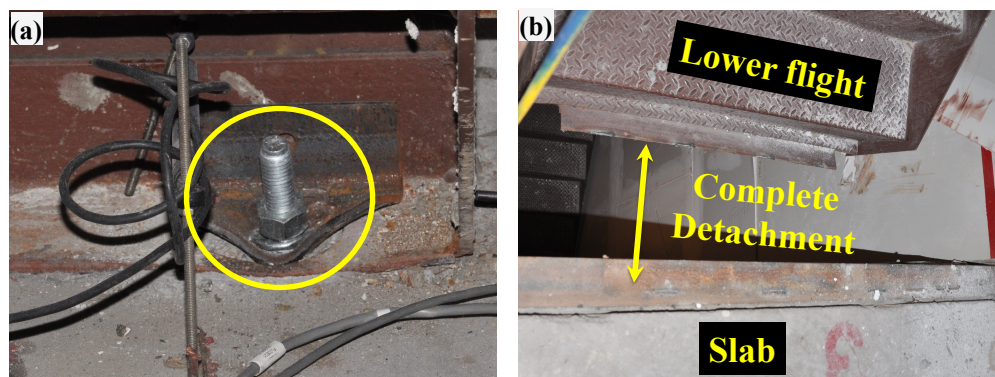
Detected stair damage following test FB-6: (a) plastic yielding of the washer plate at the lower flight to landing connection at floor 1 (DS-2), and (b) lower flight detachment (DS-3; photograph taken at level 3).
